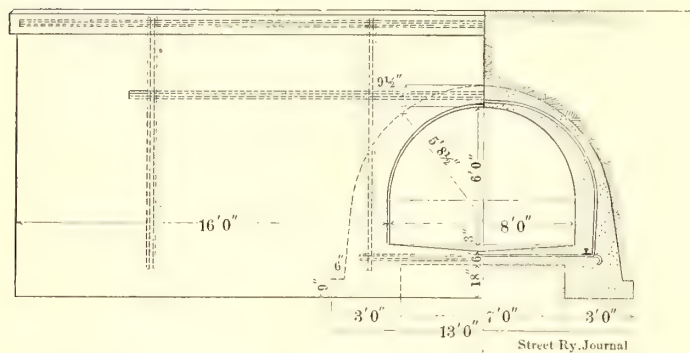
CONCRETE CULVERT FOR IRRIGATING WATER
